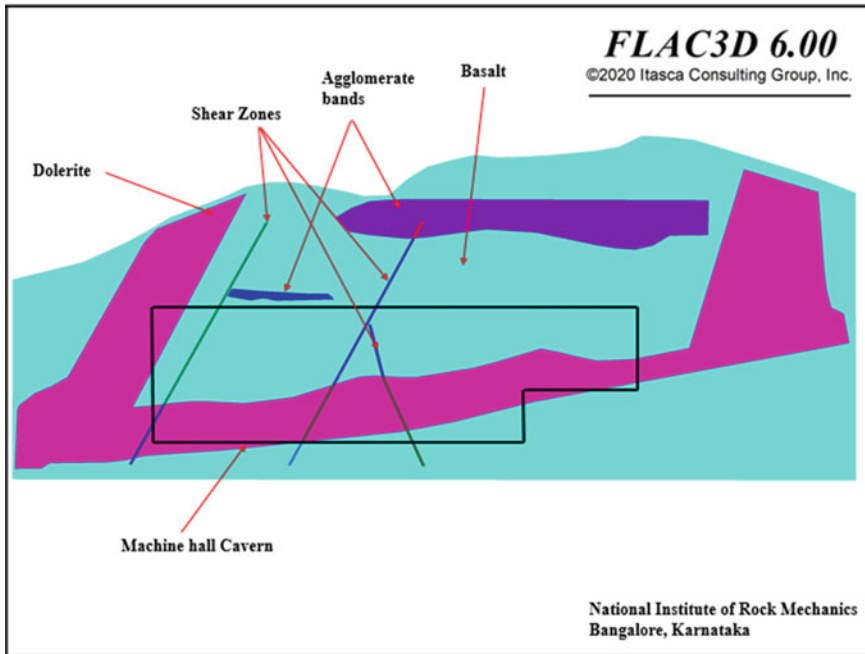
L-Section of upstream wall of powerhouse cavern showing lithology
